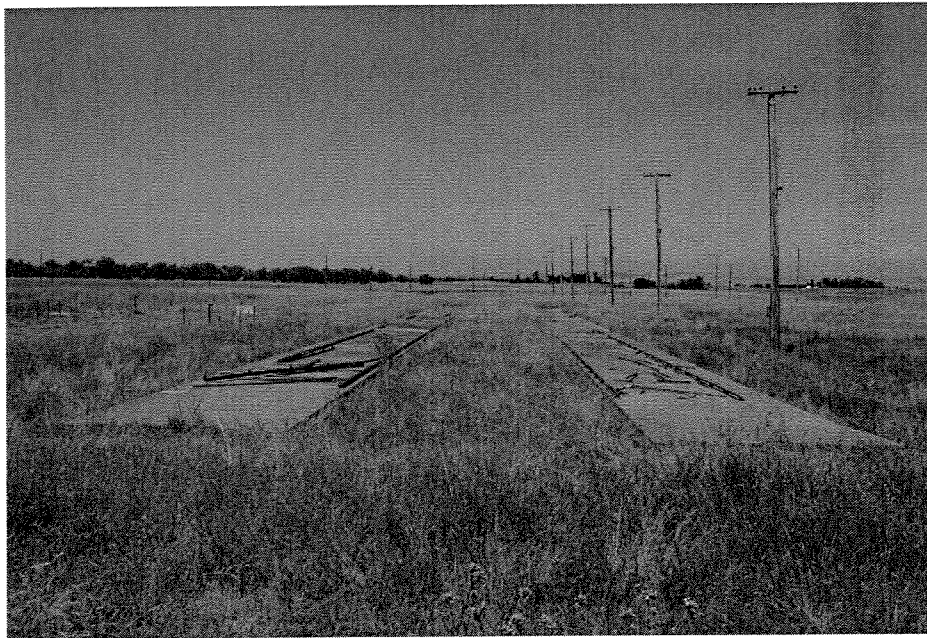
Test tracks on concrete pads west of the cryostat laboratory, Kappa Test Area, undetermined date of construction. Looking northeast. View of May 2005.
